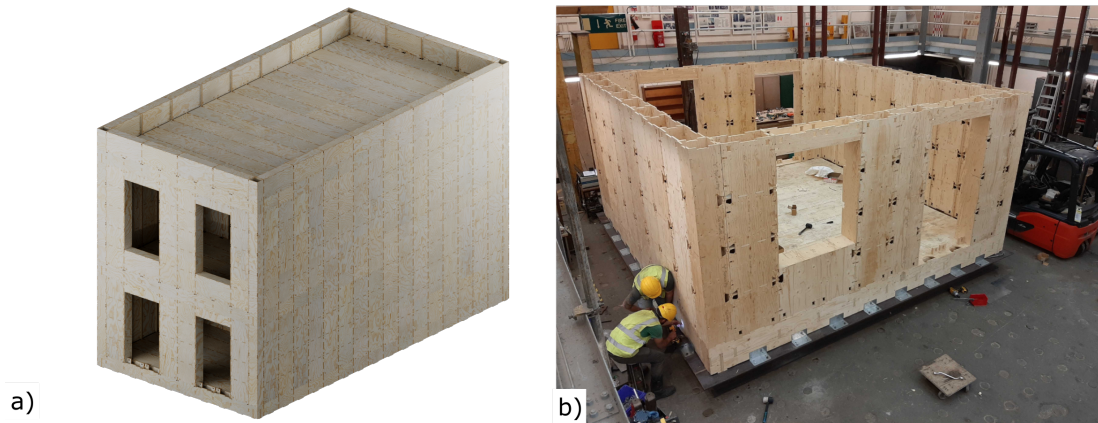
Wikihouse Skylark a) architectural render , b) building module under construction in the laboratory.
